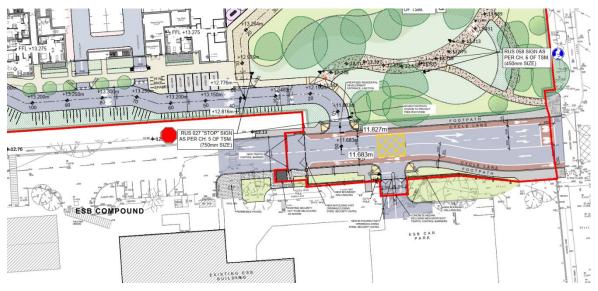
Proposed upgrade works to existing ESB Networks facility access road
